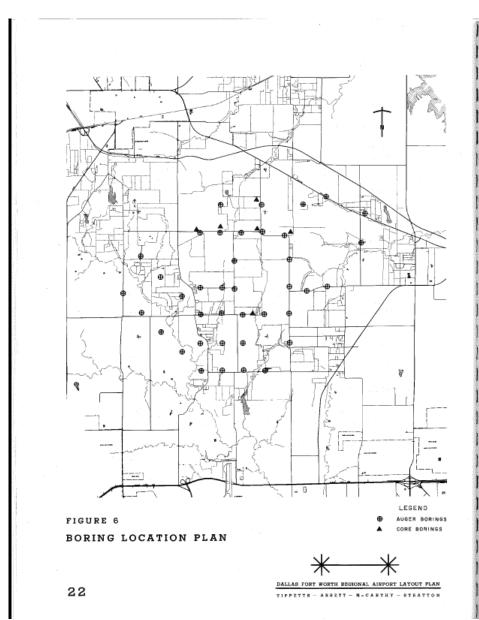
"Soil Boring" Location Diagram, TAMS, Airport Layout Plan, 1966
